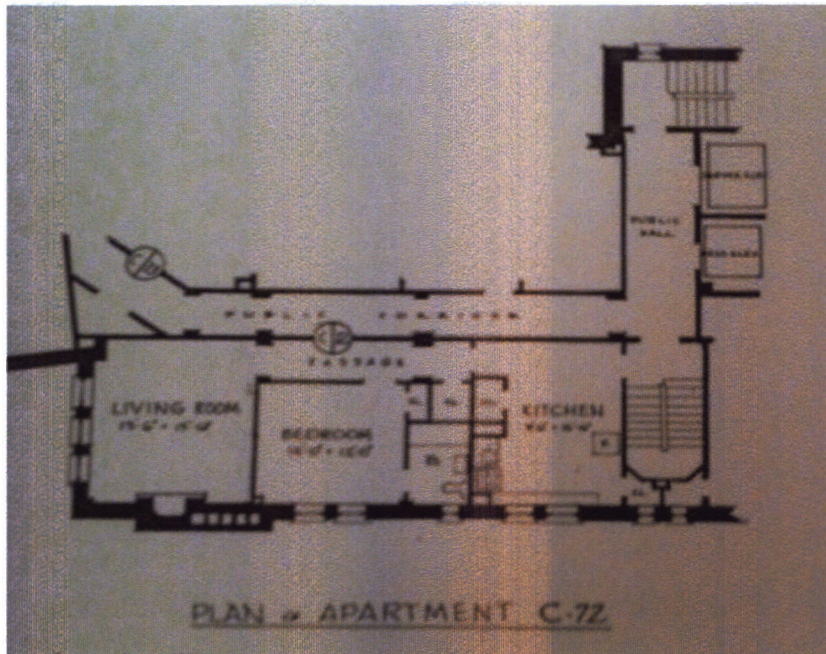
Plan of Apartment C-72 (Image Courtesy of CCA Ross and Macdonald archive)
